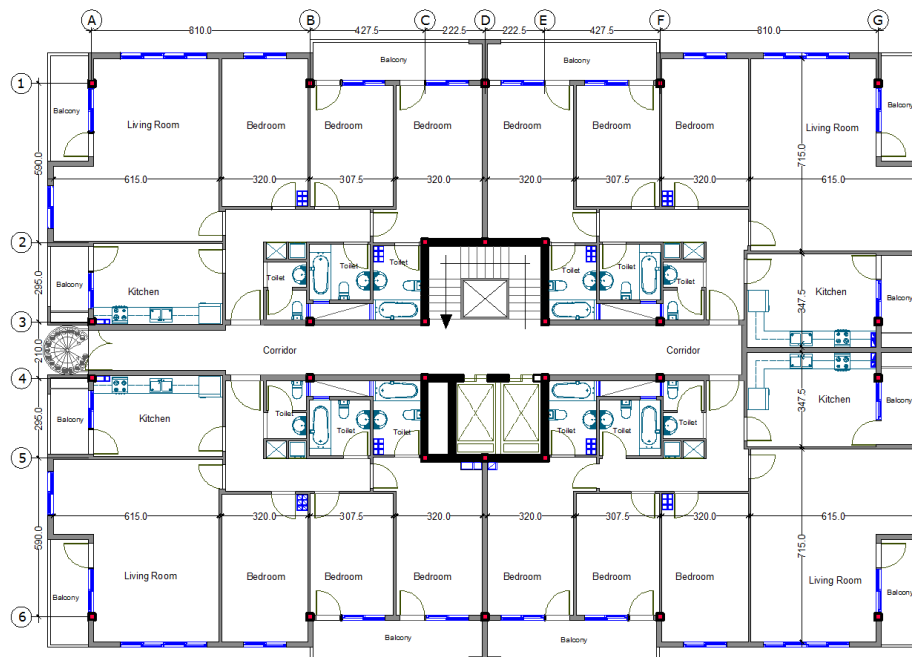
Typical (1st to 5th) floors of the building, showing the distribution of steel columns and central shear walls
